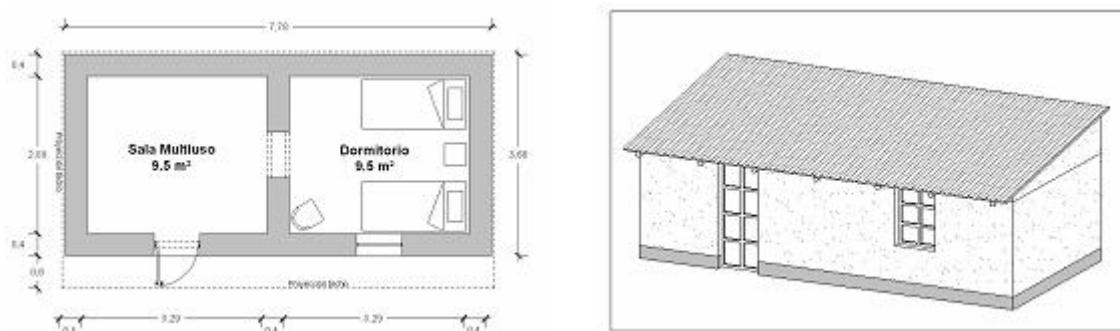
Floor plan view and Bono6000 adobe house (Araujo et al., 2008)
